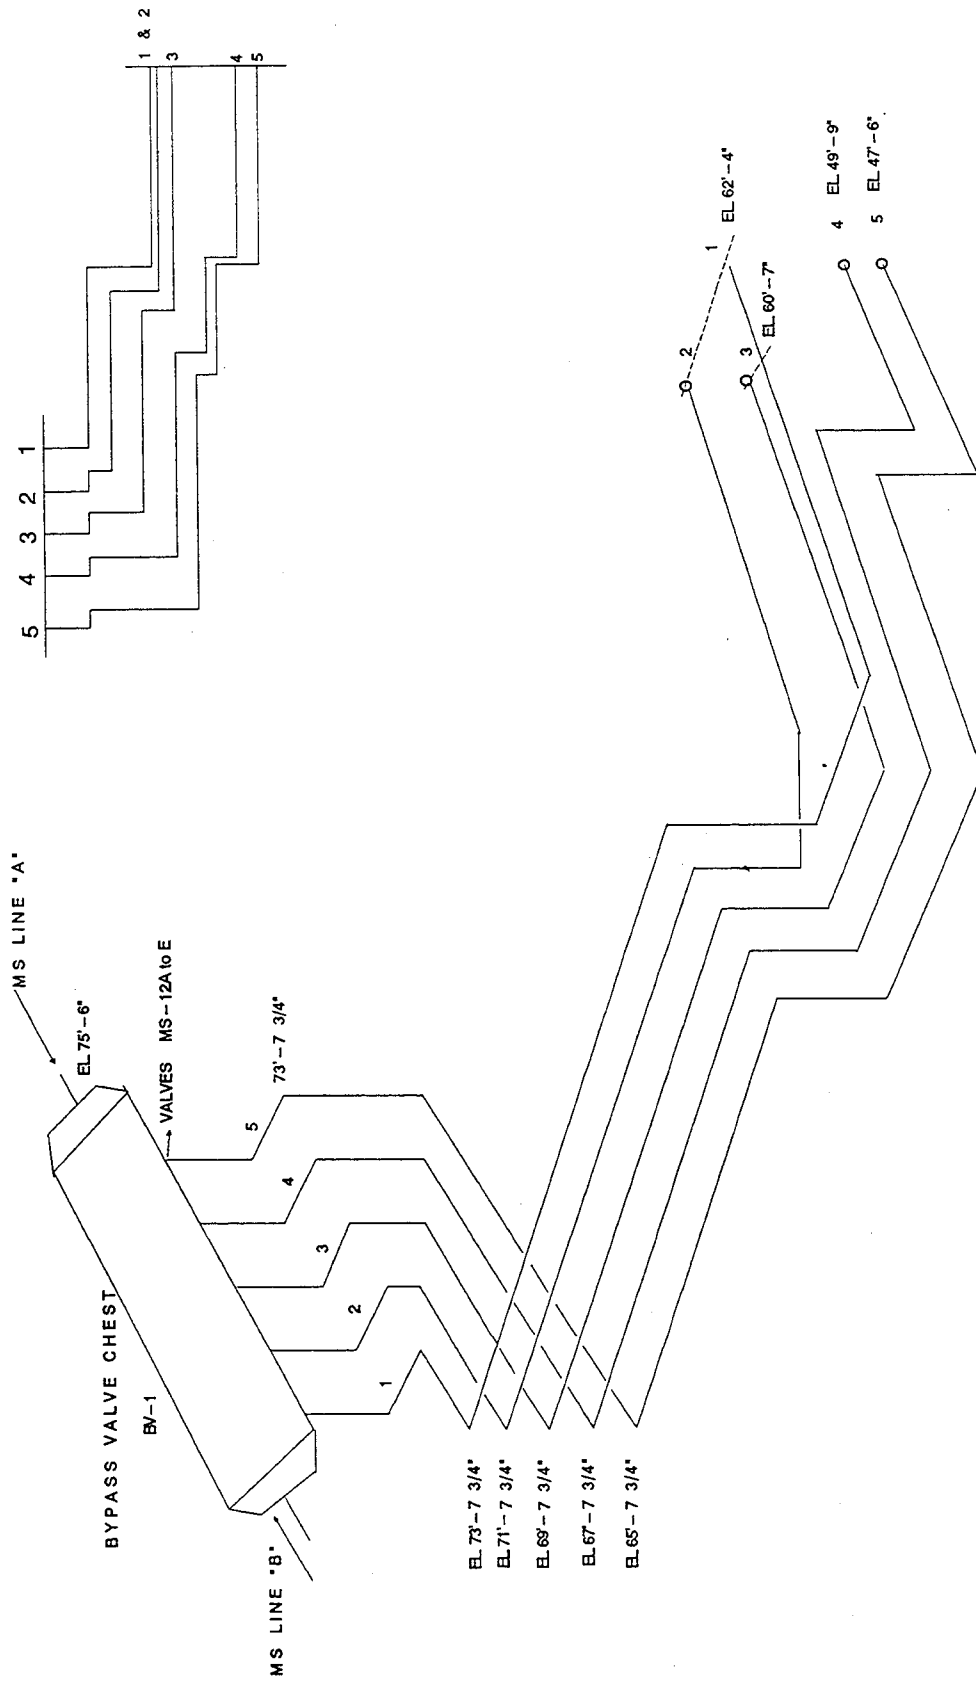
Elevation Diagram & Isometric of MS Bypass System from Valve Chest BV-1
